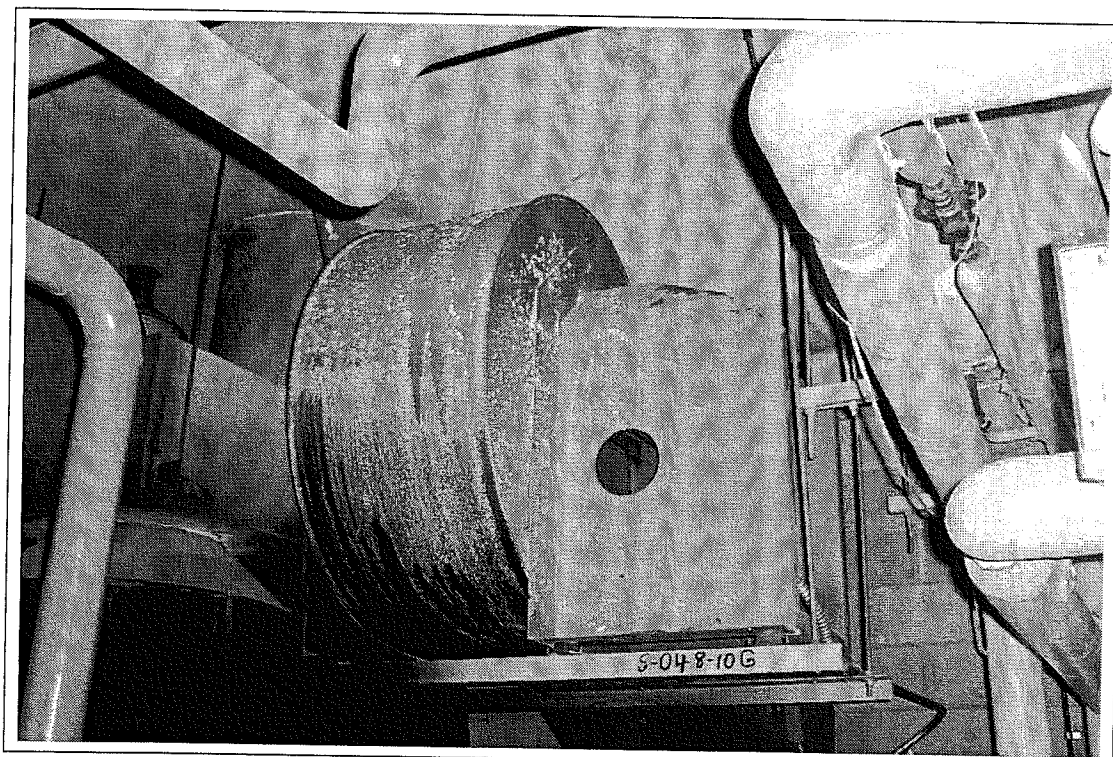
Boiler Room - Delaminated acoustical plaster dust and debris on mechanical equipment
